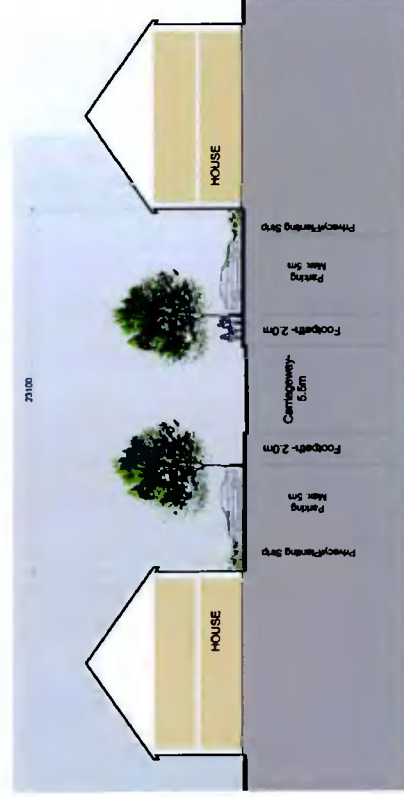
INDICATIVE LOCAL STREET SECTION
